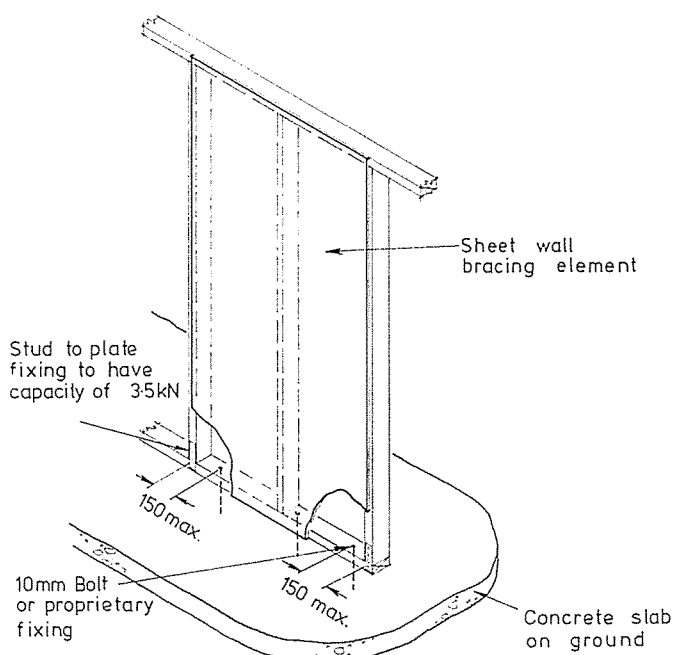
Fixing of sheet wall bracing elements to concrete slabs
